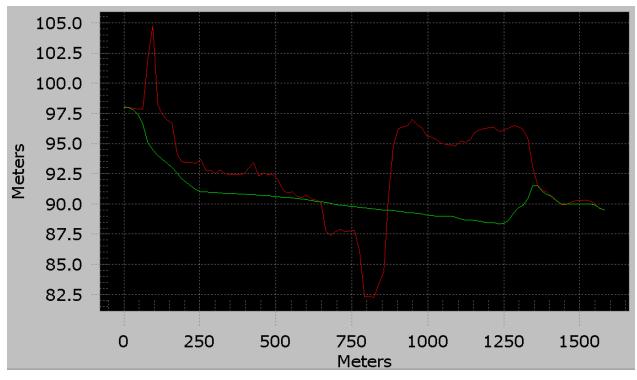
Long Section A-A (Existing (Red) & Developed (Green) Ground Elevations)
